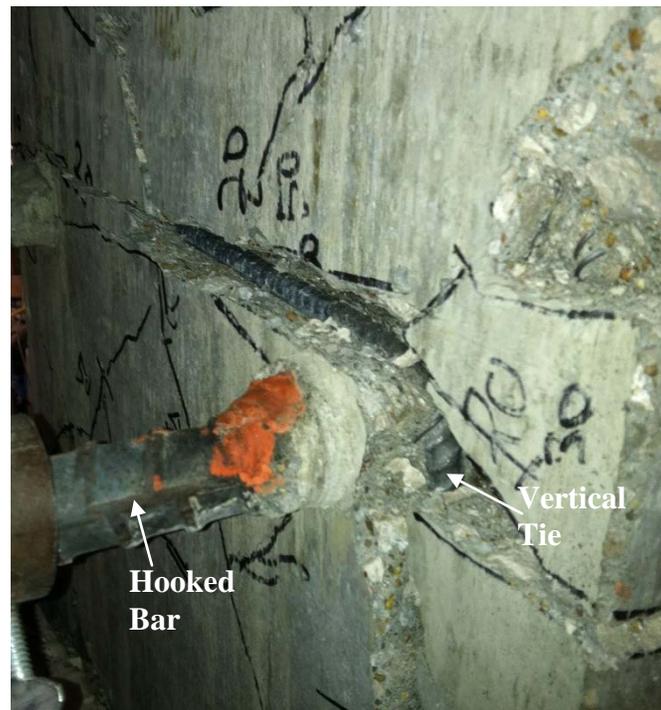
Vertical tie being pulled from the front of the column. Specimen 8-12-90-5#3vr-i-2.5-2-10 after failure
